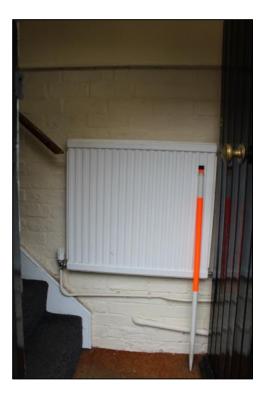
Detail of brick wall to the southern extent of the stairwell.
